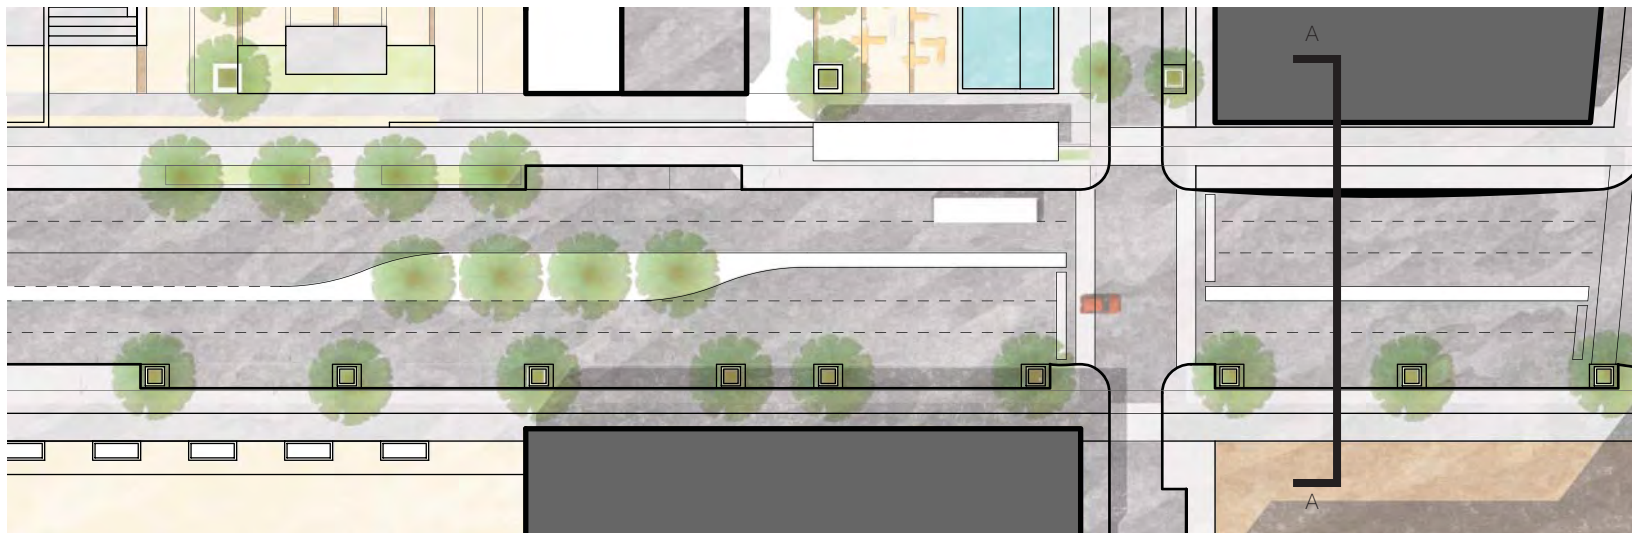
Plan of Dundas St. West extension - 30 m wide
